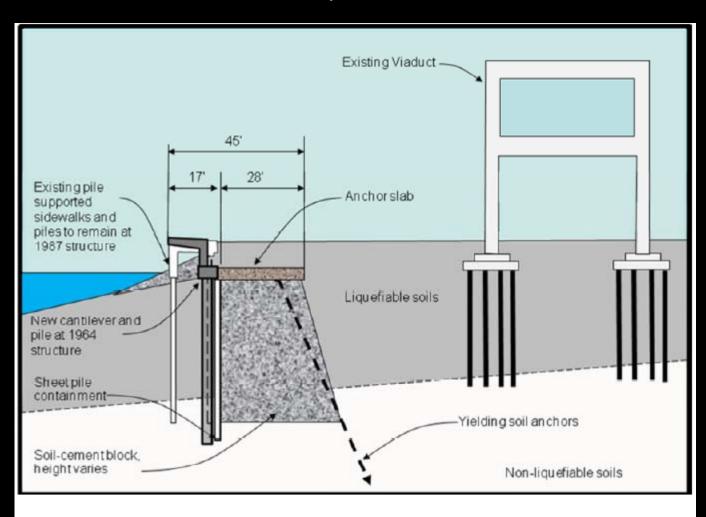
Proposed Anchored Soil Improvement Concept at Pile Supported Sidewalks
